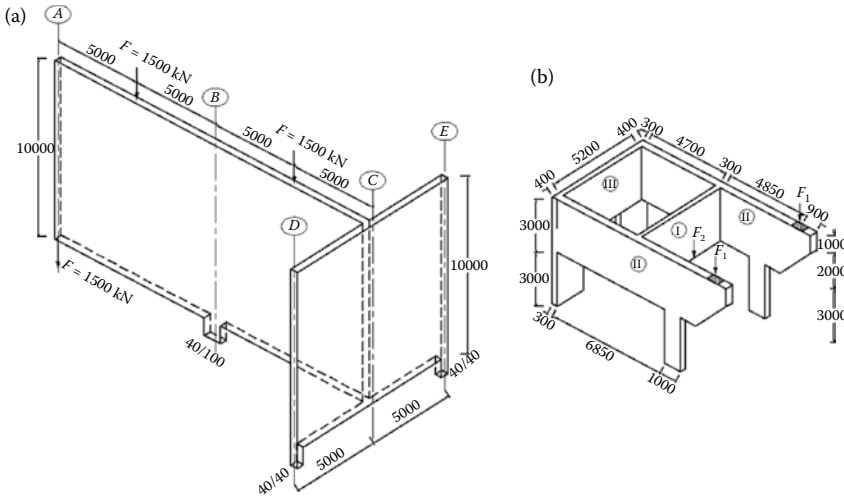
Examples of deep beams with indirect supports: (a) tee-shaped deep beam and (b) 3D structure. (Adapted from Schlaich, J. and Schäfer, K., *The design of structural concrete*, IABSE Workshop, New Delhi, 1993.)
